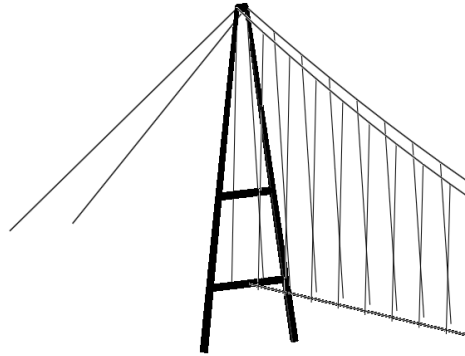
Fixed concrete tower based on the Hardanger bridge design
